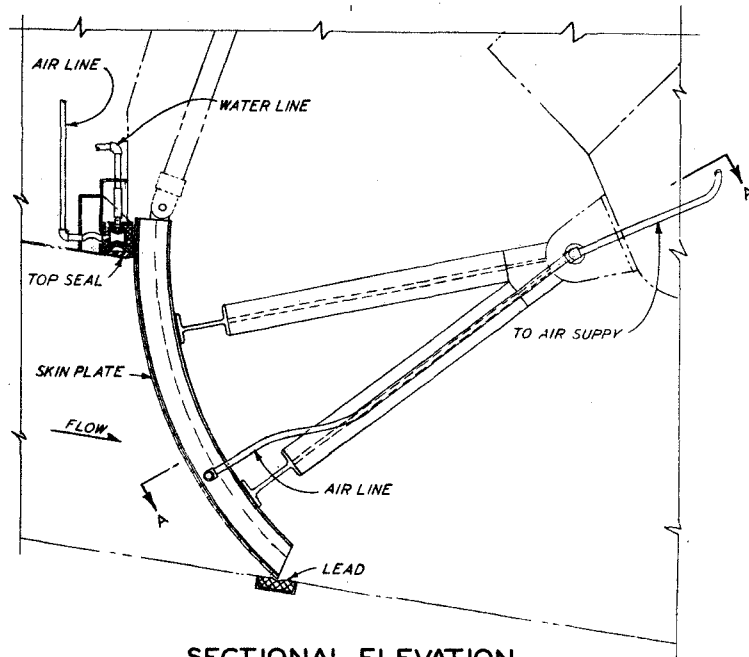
## DETAILS OF SEALS AND FIXED TRUNNION-TYPE GATE
